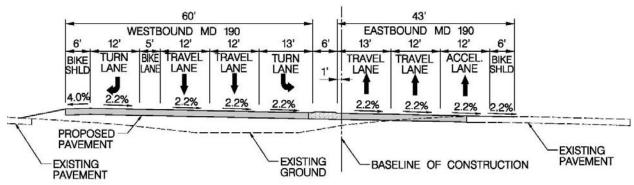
Alternative 1 - MD 190 Intersection East of Pyle Road
